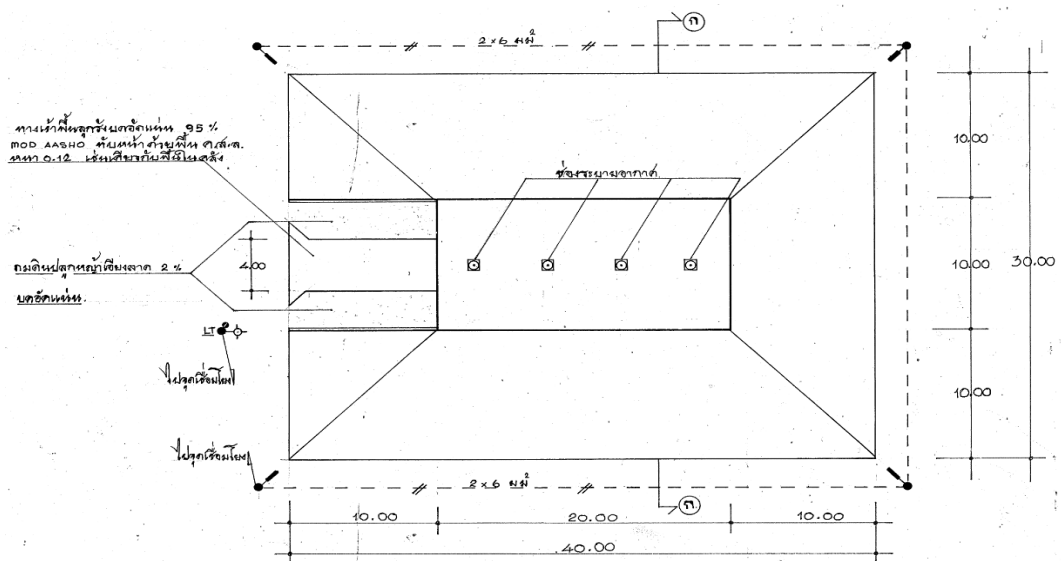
Construction drawings of the existing Ammunition storage in Thailand
